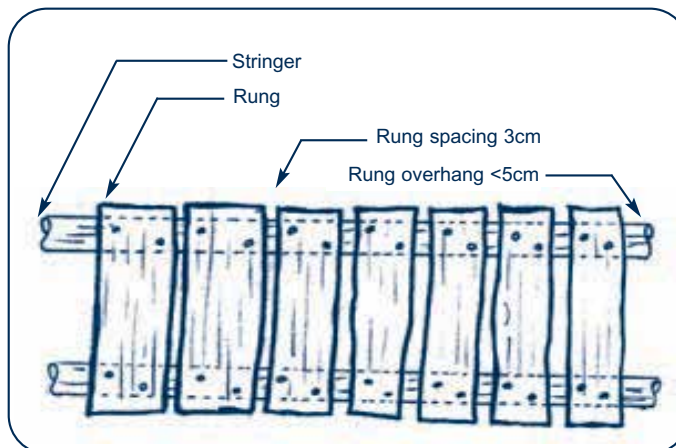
BRIDGE RUNG SPACING, RUNG OVERHANG
